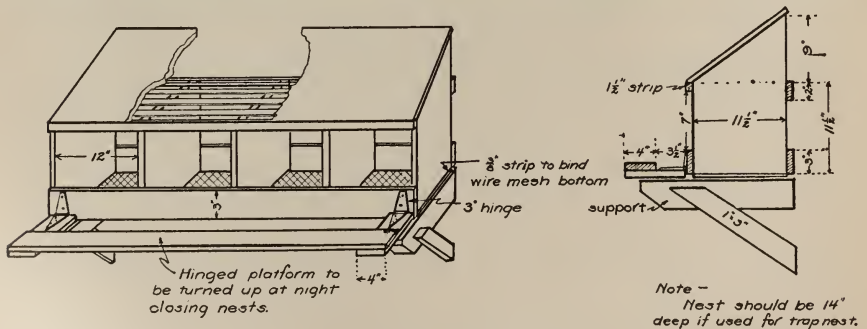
Working plans for wall nests shown in figure 69. (From Cir. 268.)
